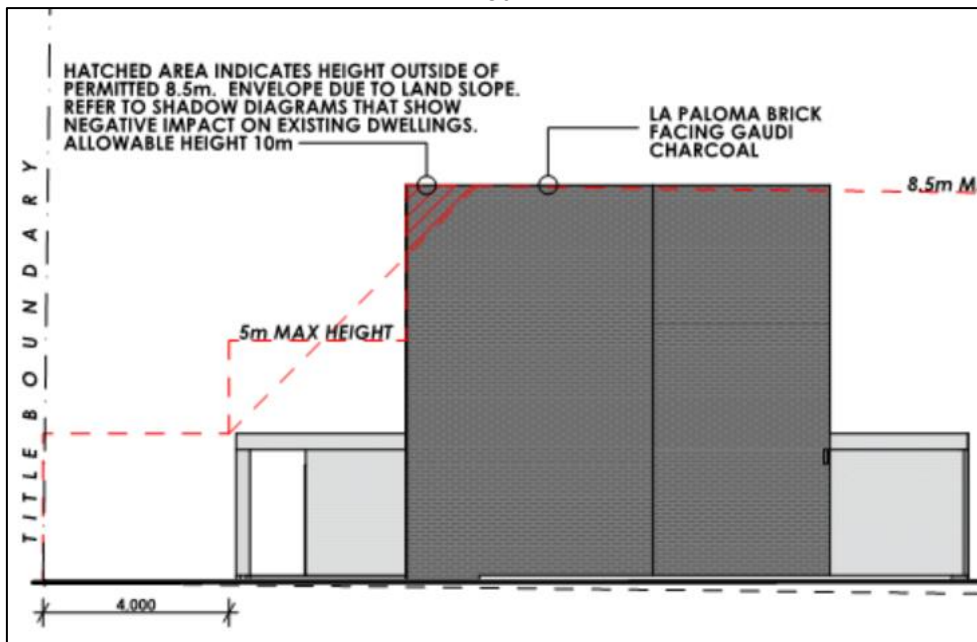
southern elevation showing western building with area outside building envelope shown hatched in red (this is the same part of the building as shown in Figure 23)
